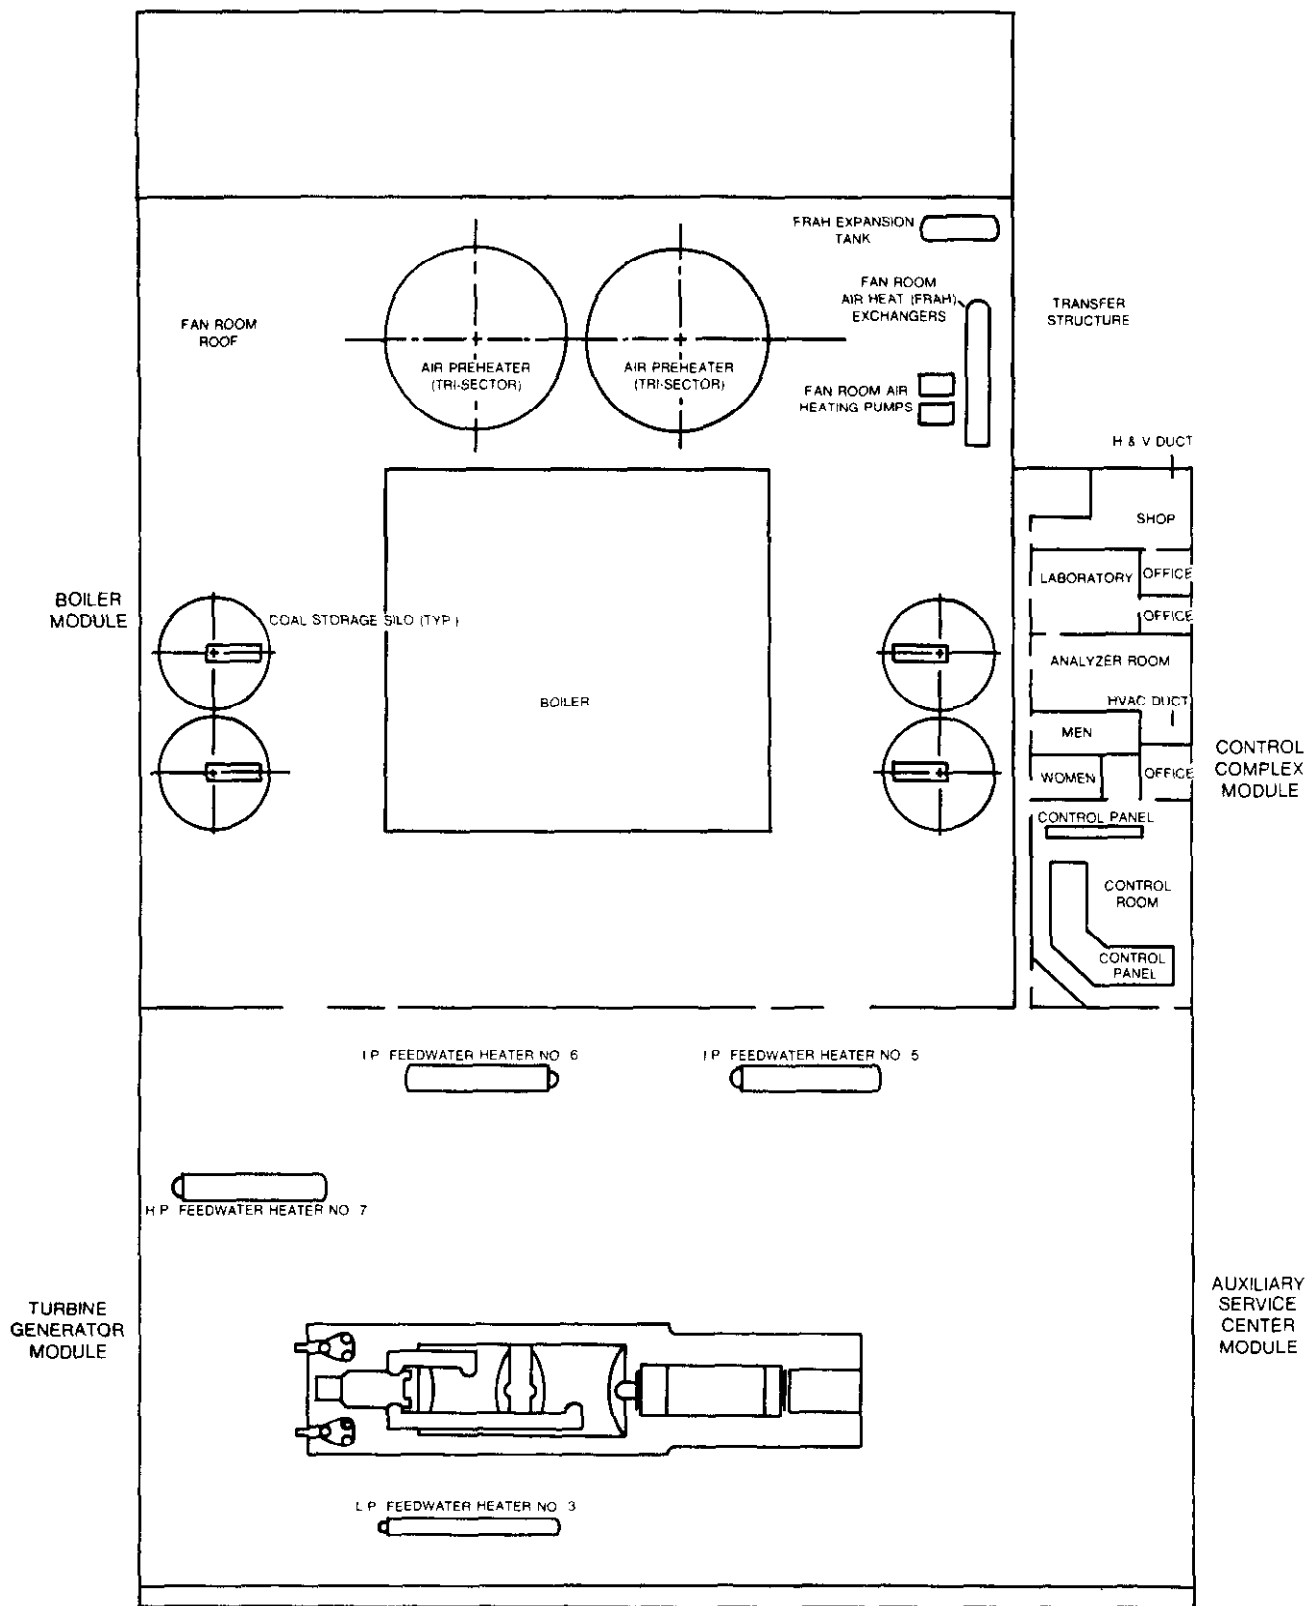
500 MWe Reference Plant Arrangement Elevation
